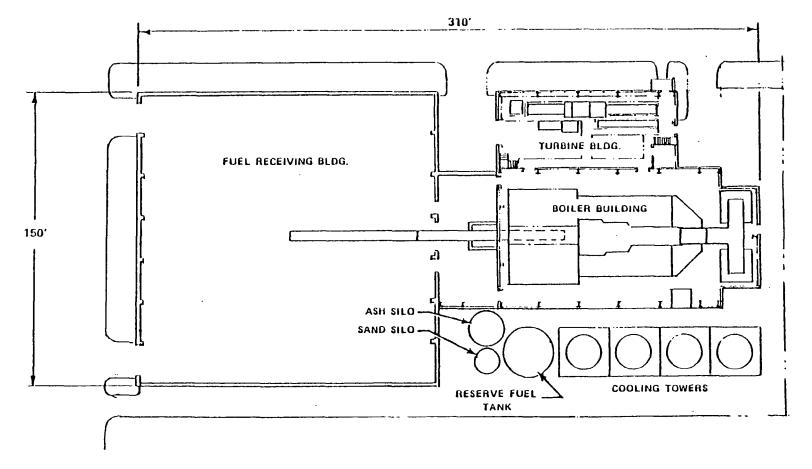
SITE PLAN STANFORD SOLID WASTE ENERGY PLANT
